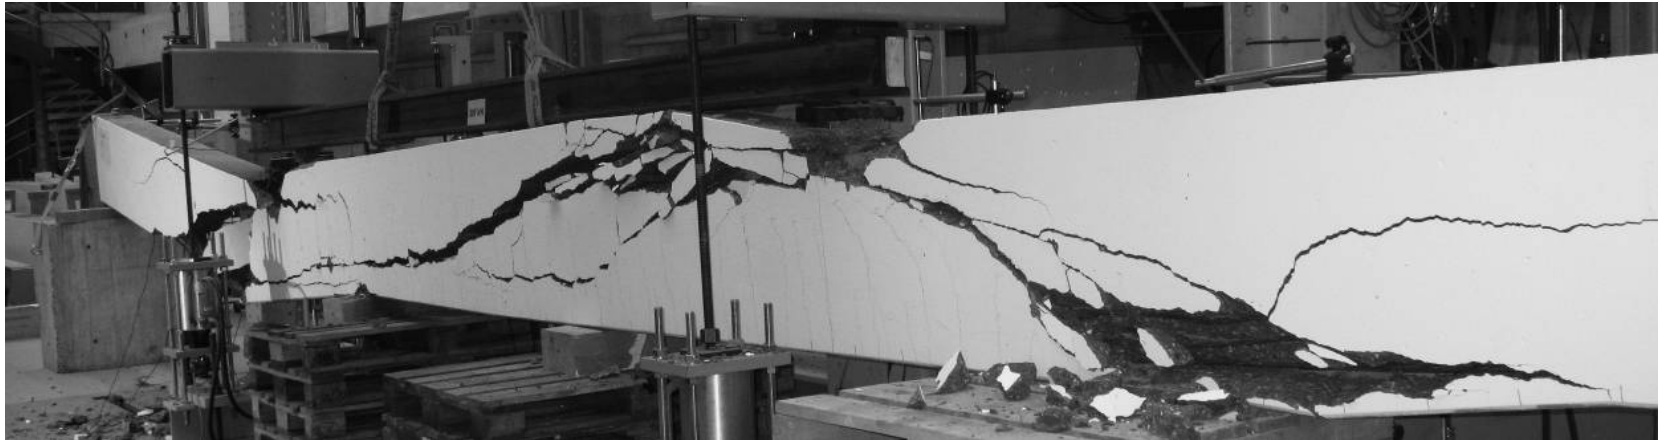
Beam AF-1 after the failure,  $V_R$  170 kN
